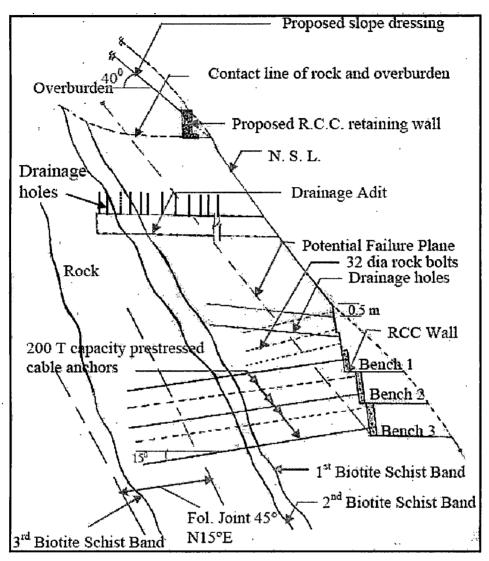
Sketch showing stabilization measures including installation of cable anchors
